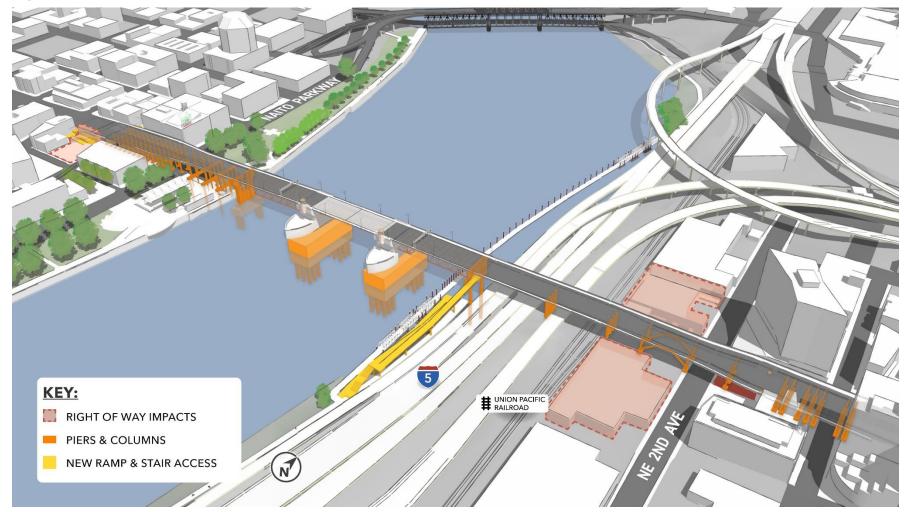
Enhanced Seismic Retrofit – Pier and Bent Locations, Plan View
